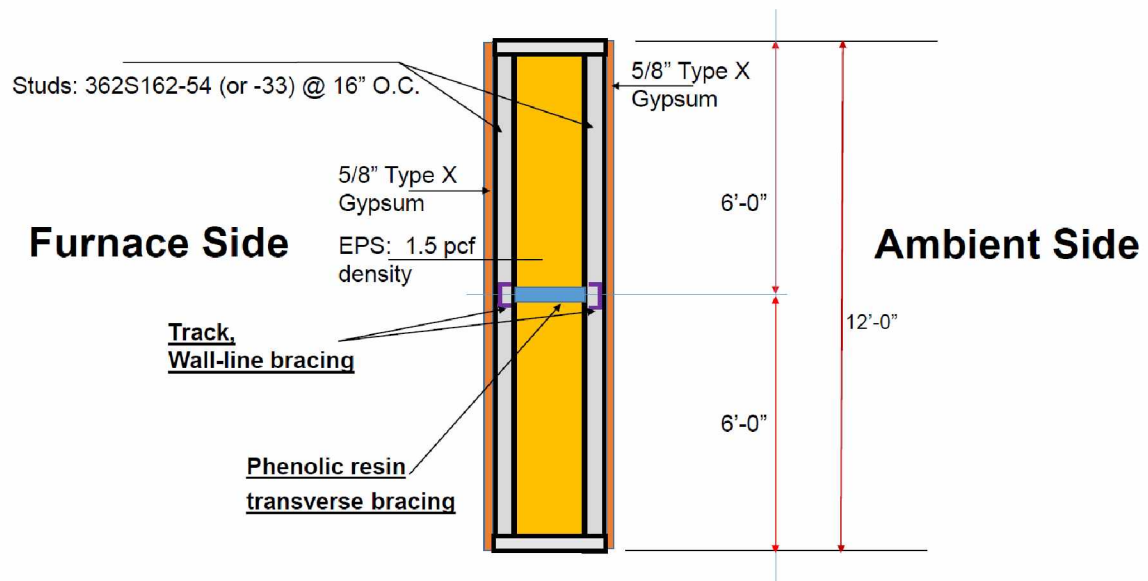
Side view of a single layer of gypsum board wall assembly with 6 ft O.C. transverse bracing
